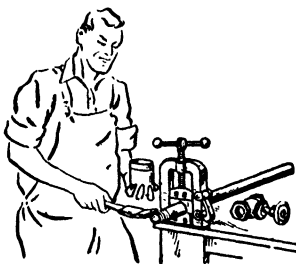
Put compound on male threads only, and keep it off end of pipe. (Courtesy of Crane Co.)
